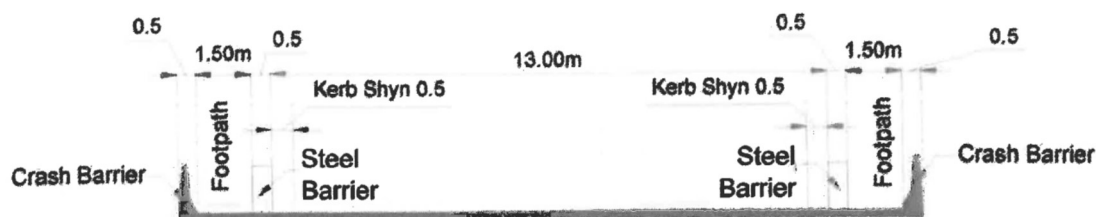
Typical cross section of bridge for 2-Lane Highway with paved shoulder and protected footpath (Open country - Plain/rolling terrain)
